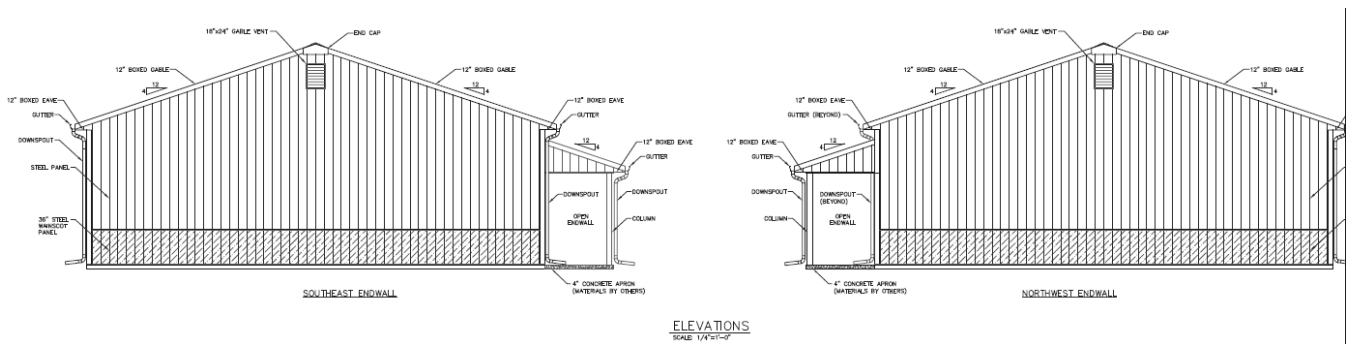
Side Elevations of the outside storage that will be built in the back of the property.
